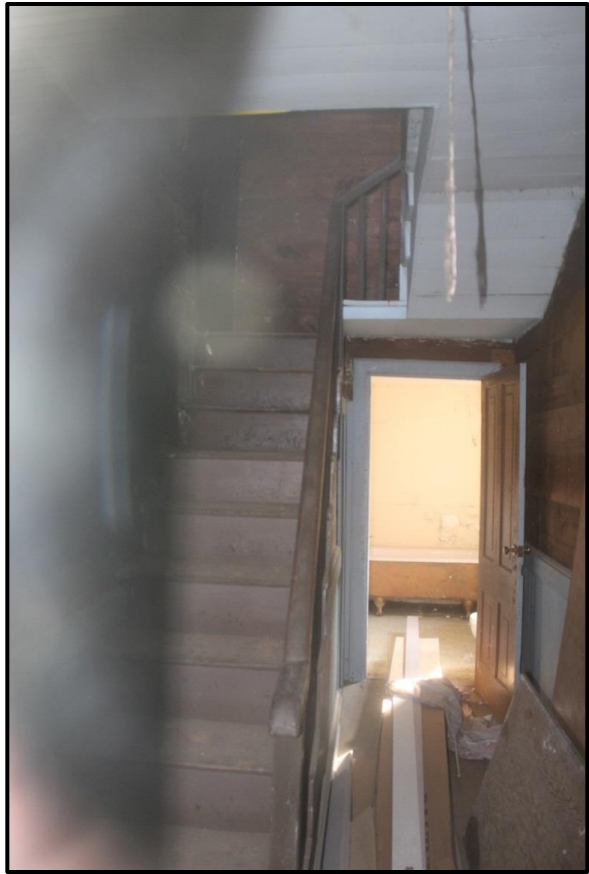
Front Hallway, Looking Northeast through Front Entry Door.
